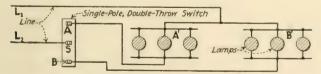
Single-pole double-throw switch connected so that only one group of lamps can be lighted at a time.
